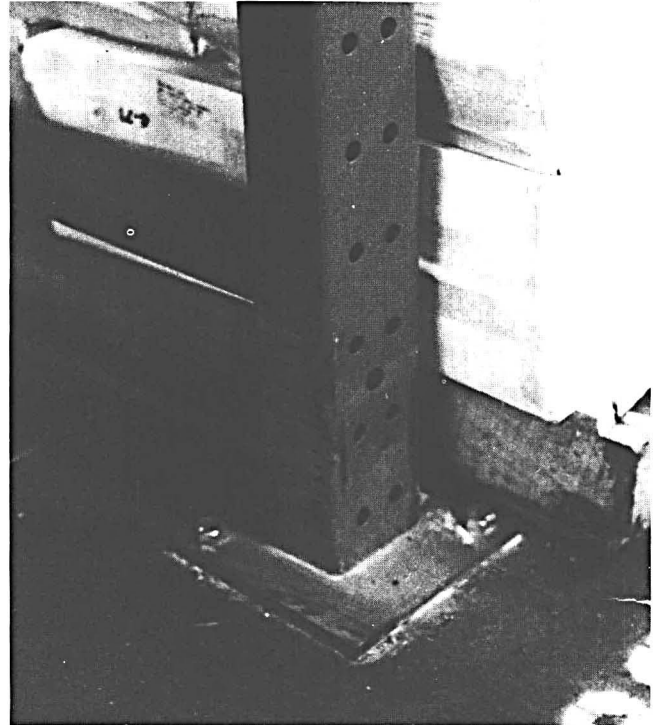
Loaded legs supporting high-rack storage must have base plates of adequate size to prevent bearing or shear failure in the slab.
